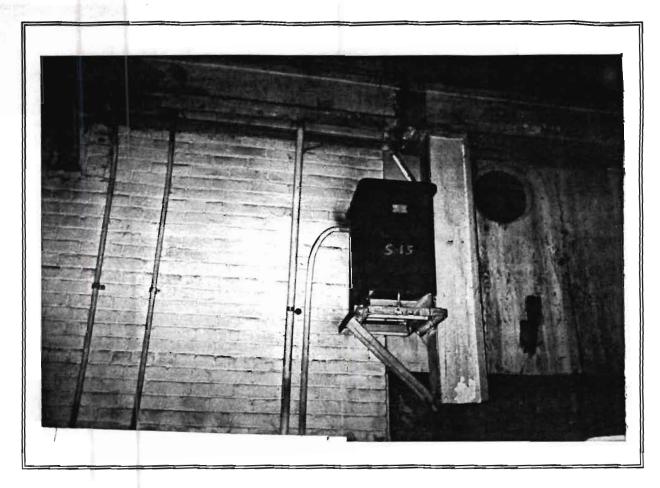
Column-mounted 25 KVA transformer located within warehouse building.
